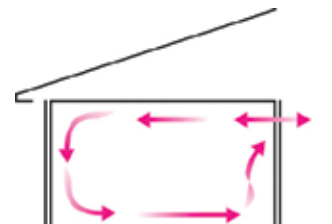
Hot Climates – Cold air would be blown down against the warm glass from ceiling registers located above windows. The “blown” air would fall to the floor level and air would flow across the floor, be heated, rise upwards, and be picked up at the top of interior walls by a return register.
